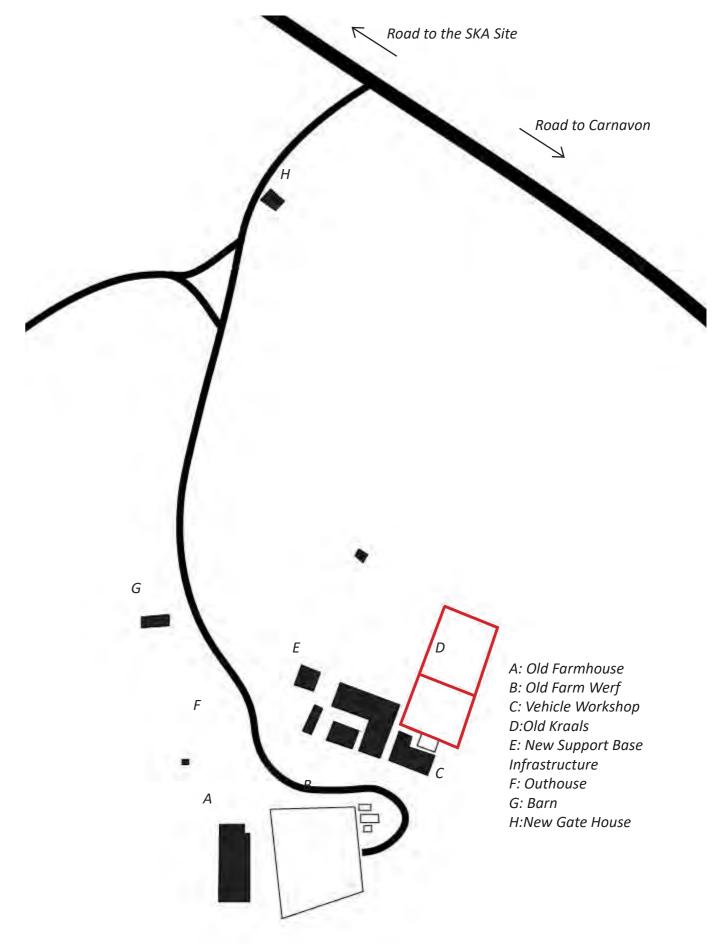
Site Plan of Klerefontein Farm highlighting the Kraal
